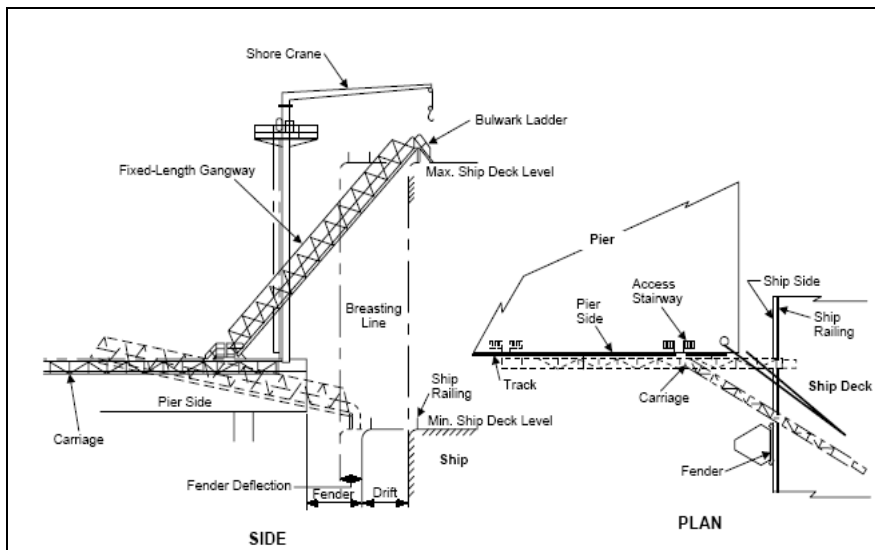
Carriage mounted with track parallel to pier face, attached to side of pier (mobile system)
